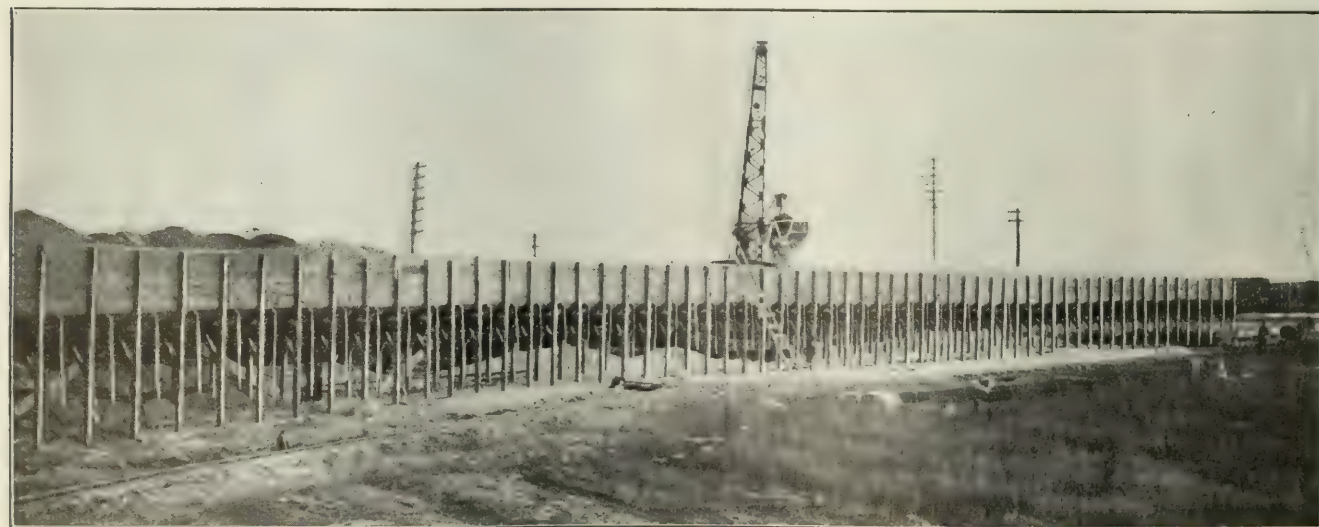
UNLOADING STONE AND SAND INTO ELEVATED BINS FROM RAILROAD
